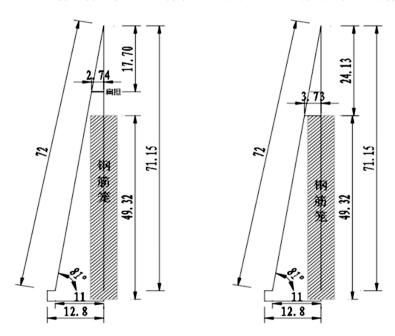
Dimensions of main hoist for reinforcement cage lifting (m) 图 4. 主吊钢筋笼吊装尺寸(m)
